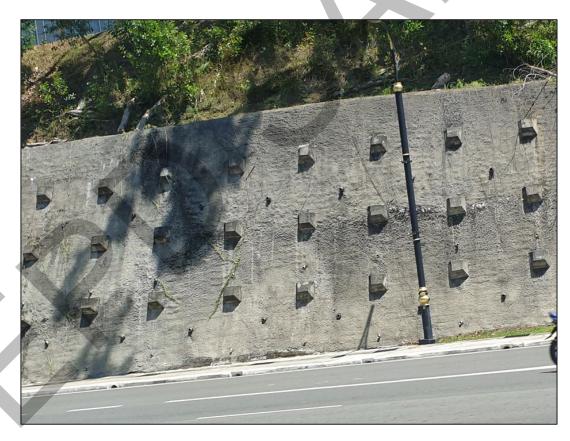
Example of soil retention structure / reinforced concrete retaining walls using the soil nail method.
